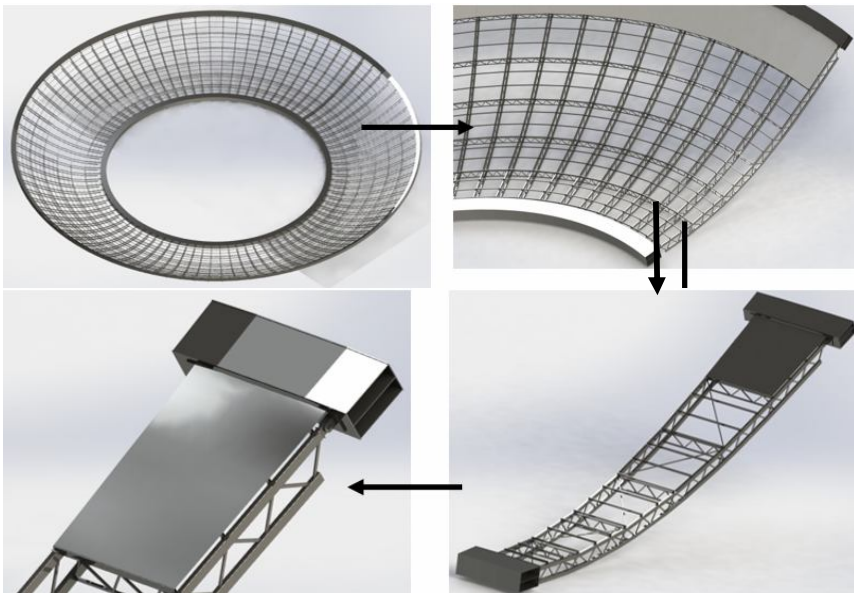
Suspension roof of the stadium with a cut on the elliptic plan.(transition from the rod scheme to 3D model)
